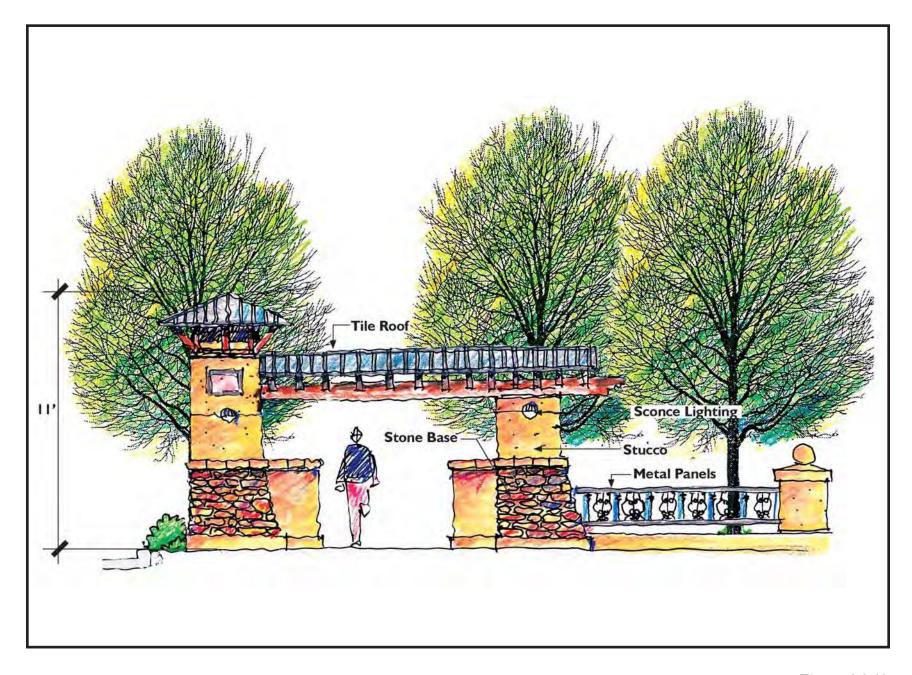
Neighborhood Entry Elevation - Typical
